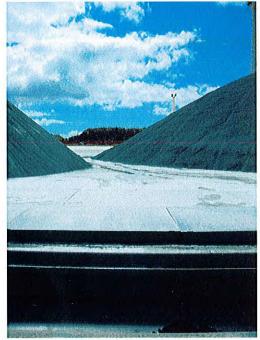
, fines and water from sand stockpile, seeping to coal conveyor trench
